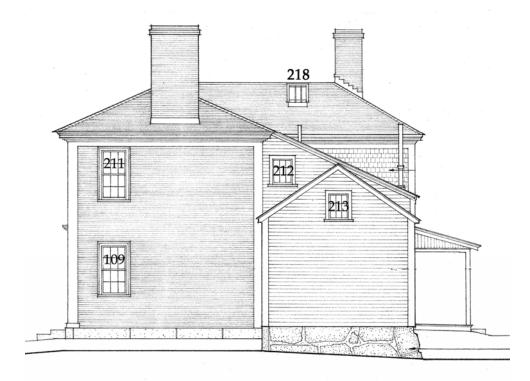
East Elevation with keyed window numbers (adapted from HABS drawings).
